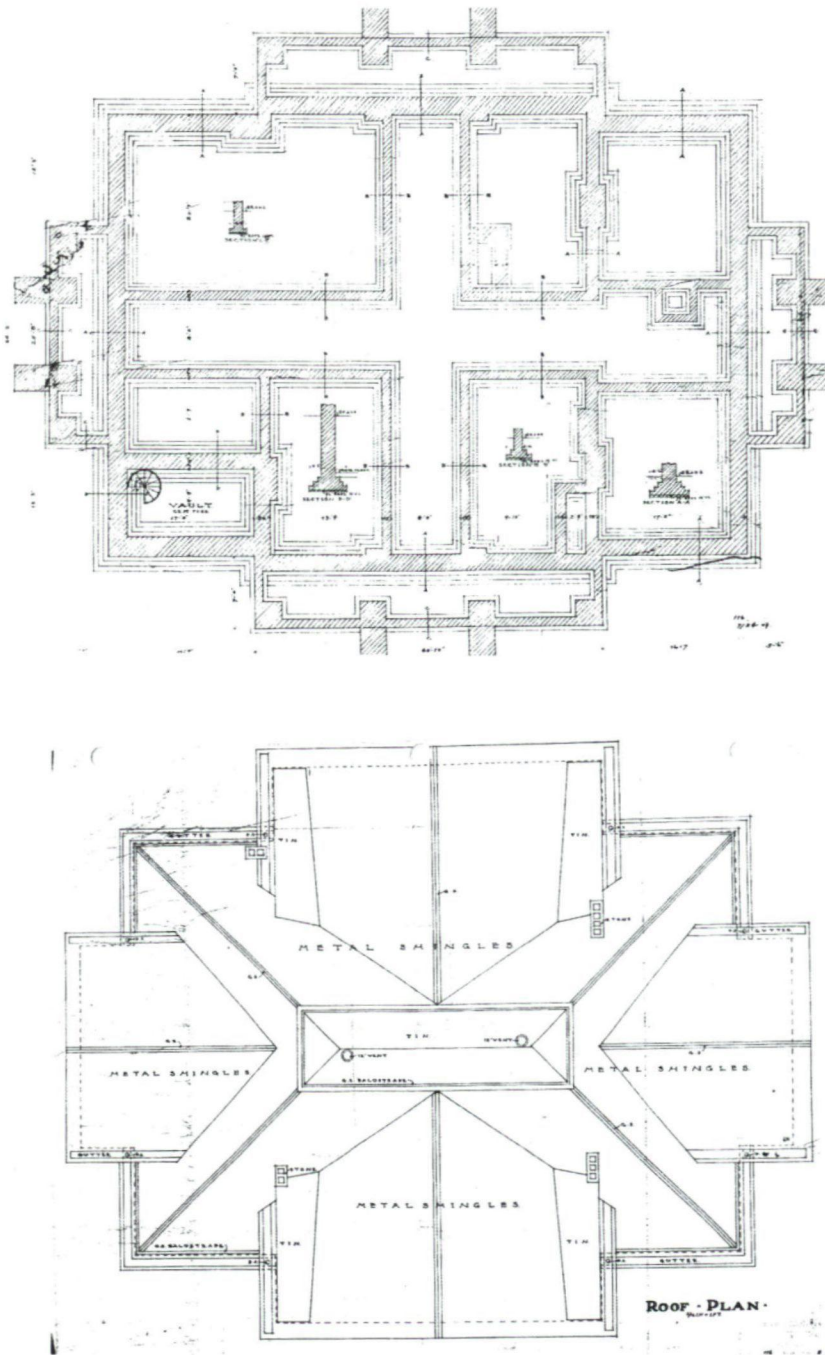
Glasscock County Courthouse, foundation and roof plans by E.C. Hosford.
